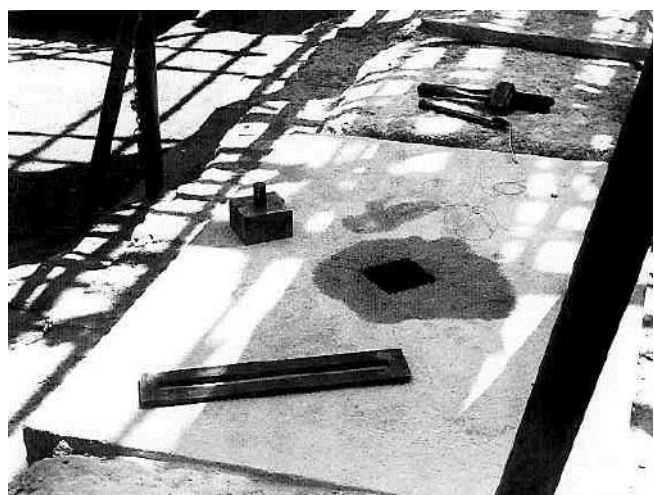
placing a connecting joint in a column drum (1994) (source: Pikoula and Papadimitriou 2002a, 169).
